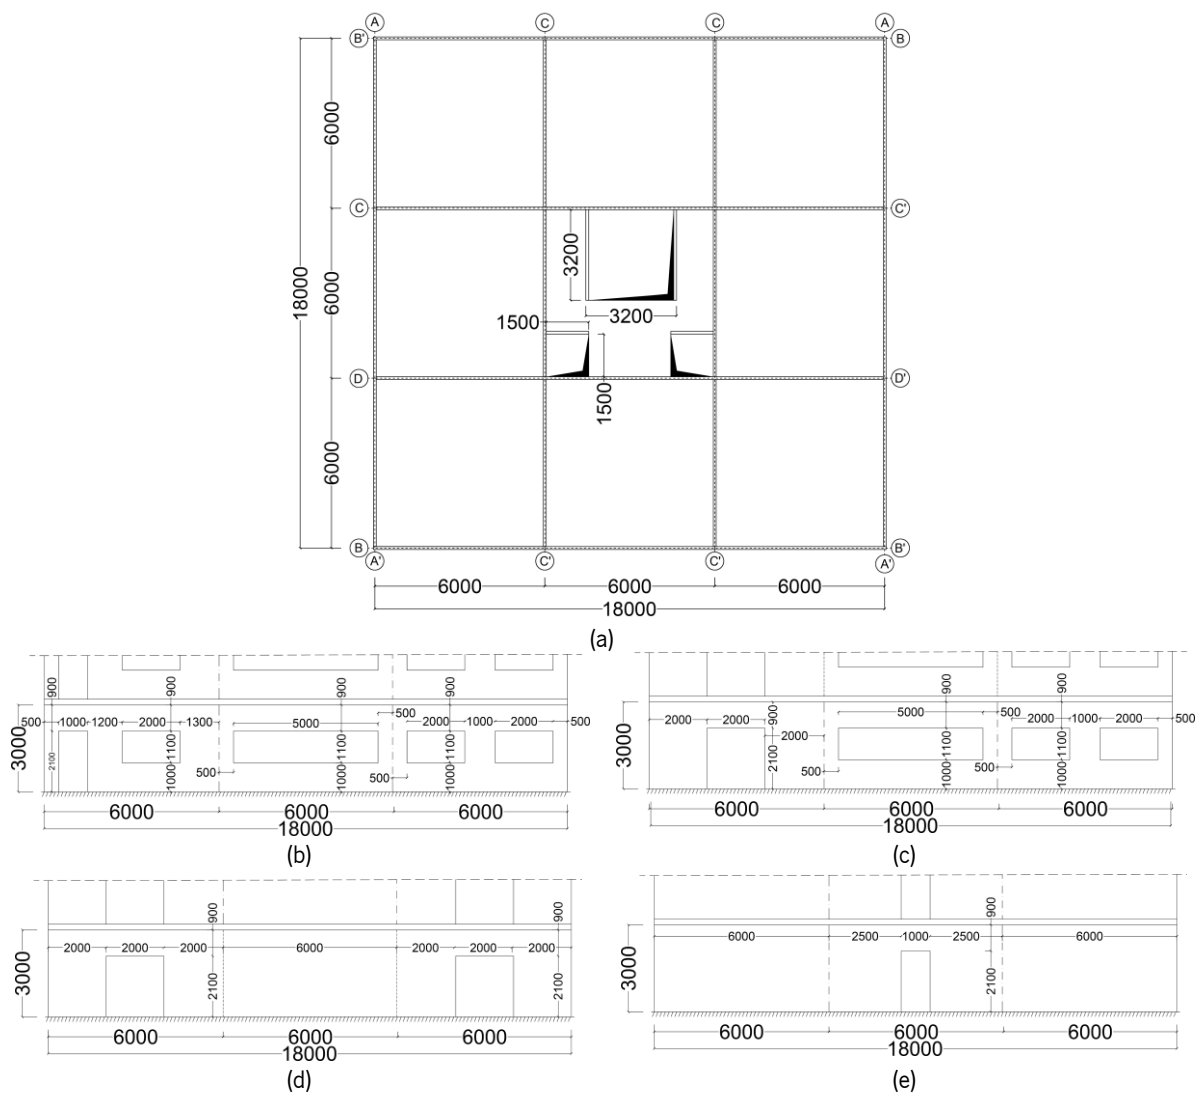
Building plan (a) and facades of A-A' (b), B-B' (c), C-C' (d) and D-D' (e). (dimensions in mm).
